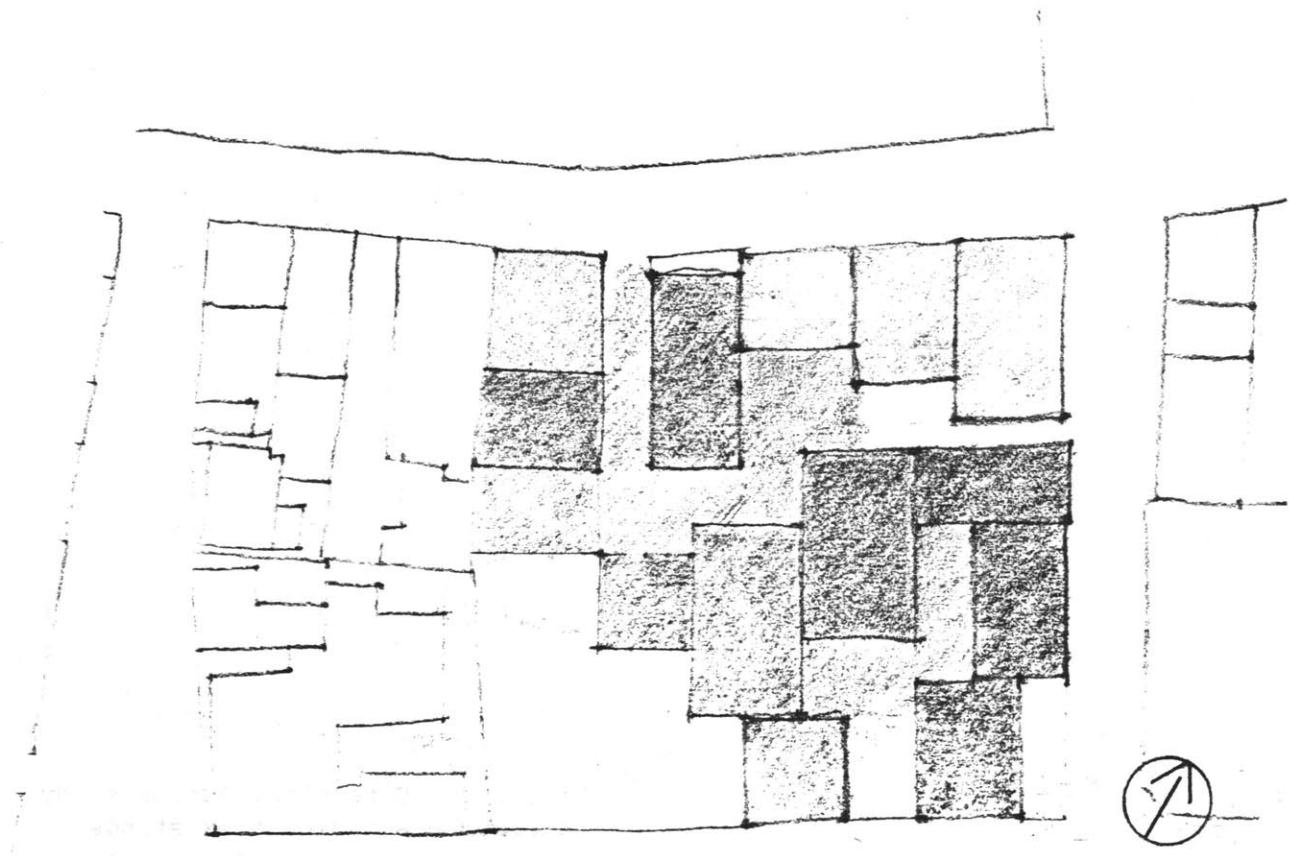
'3'. Site plan. Access study. Massing. Retaining Ethnology building but removing connecting building between. Access around Marine Building.
